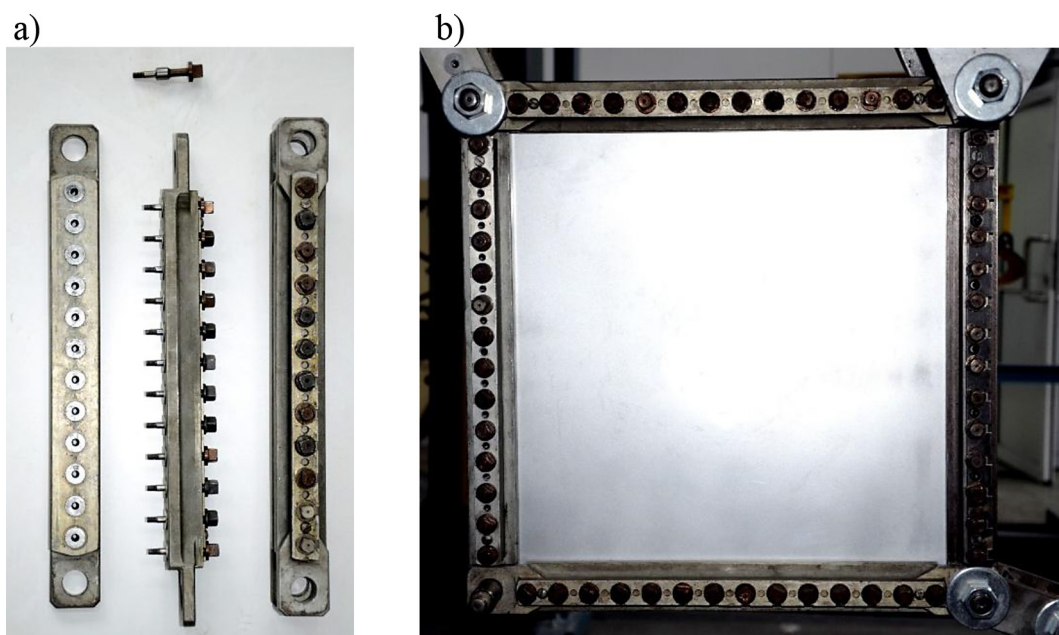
Rigid steel edges: (a) parts of edges, (b) The complete assembly, including the shell
